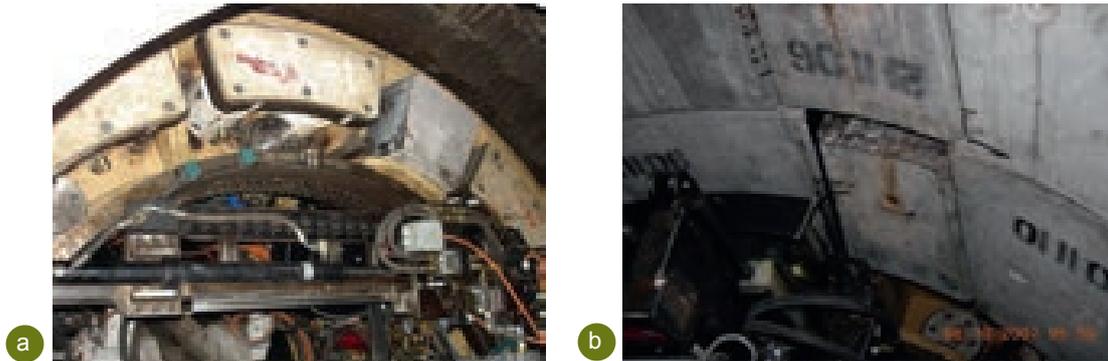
Insertion of the key segment: (a) the key segment is placed in a key holder in the tunnelling machine; (b) the key segment placed inside the lining ring.
